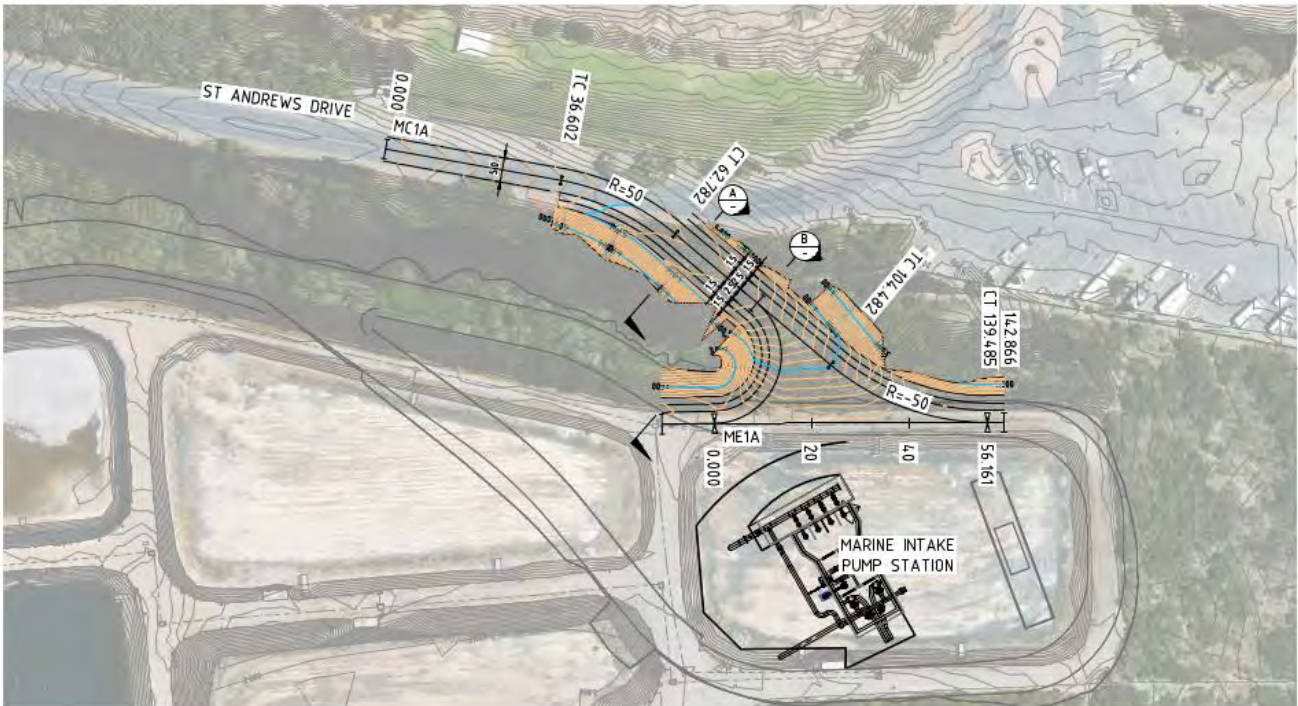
Proposed temporary access track to marine intake pump station (Concept drawing EPDP-300-SMC-TFM-SKT-0011)
